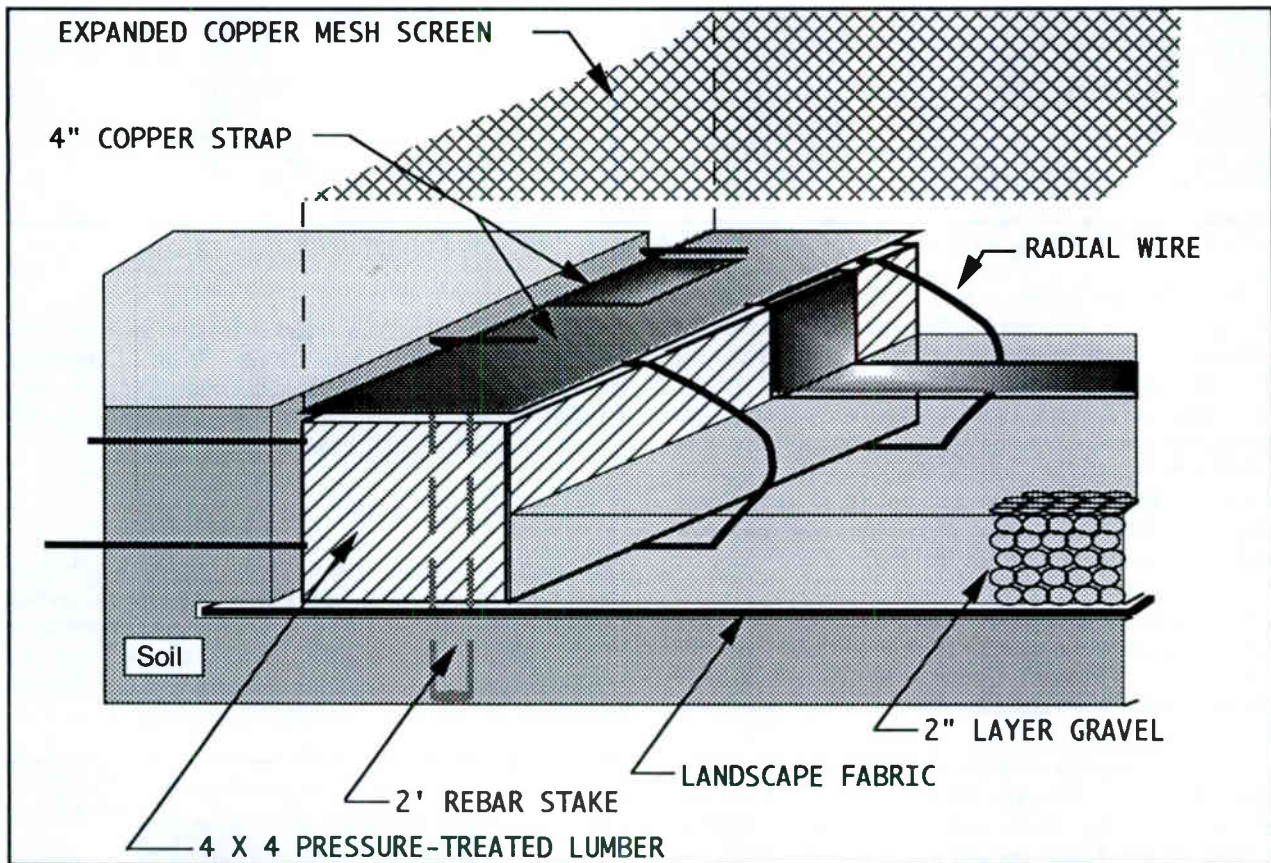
Figure D. Exploded cross-sectional drawing of a section of interior ground system perimeter frame. Note that approximately four more inches of gravel (not shown) will cover the finished copper screen.
